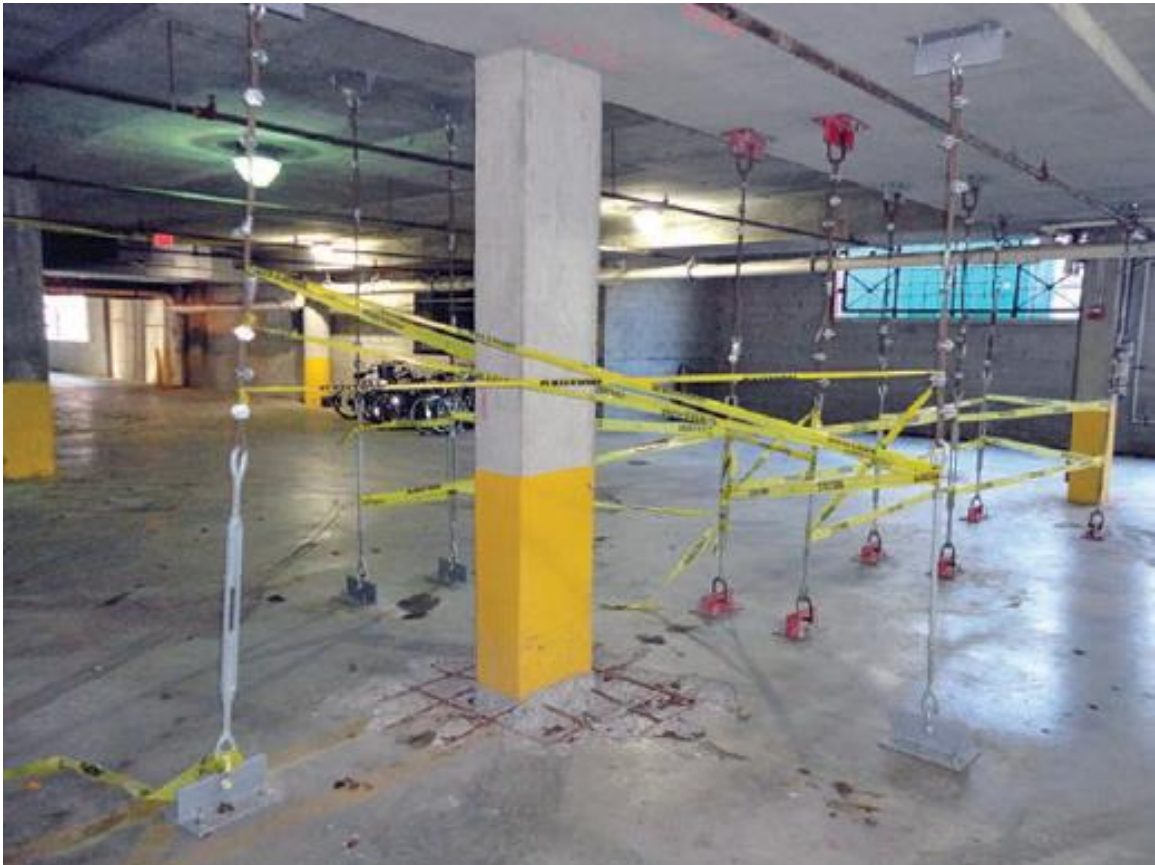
Parking Garage Column Below Residential Tower Cracked and Spalling at Base Due to Uneven Flood Loads Source FEMA P-942 p5-7
